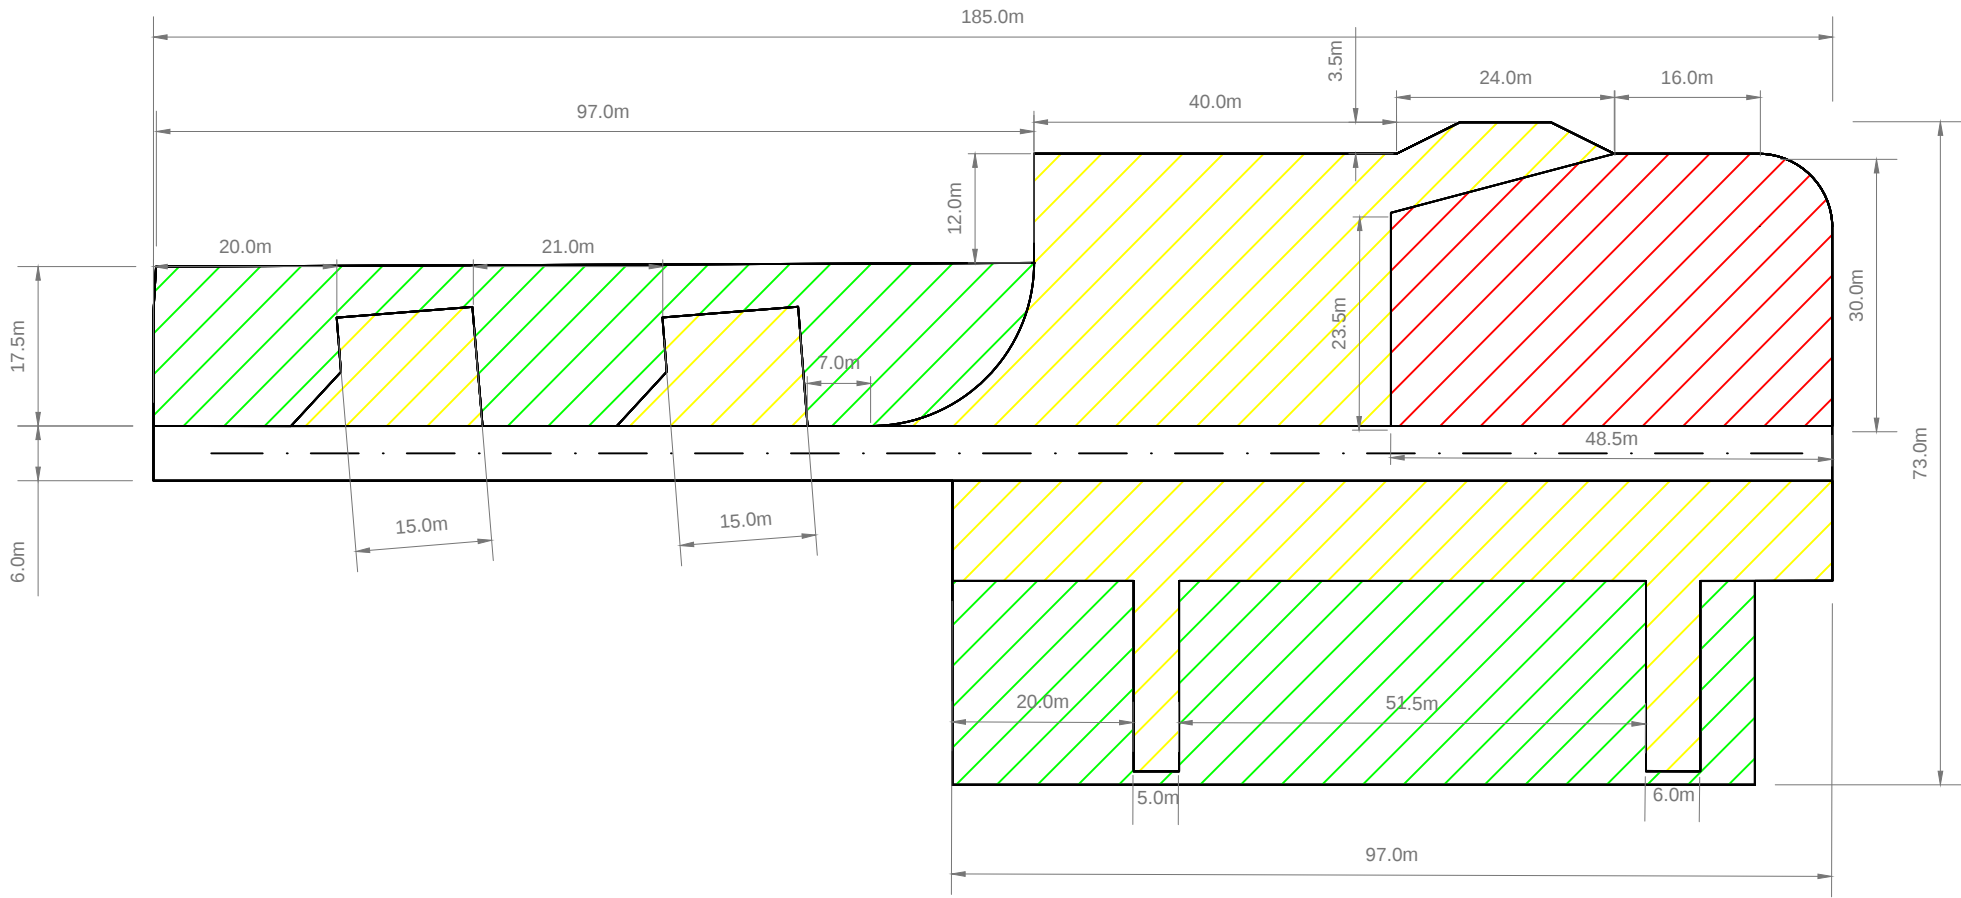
Bespoke Hardstanding Layout Plan T1
